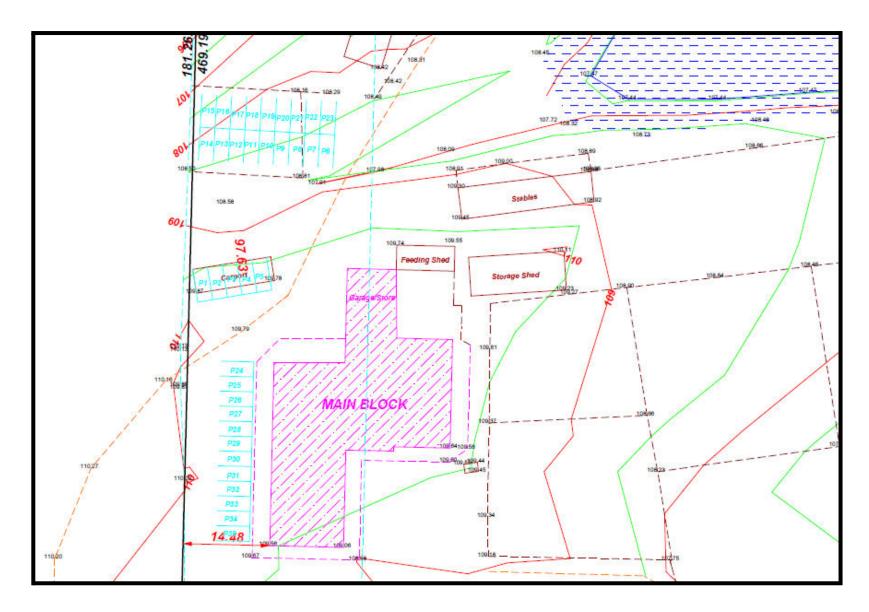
B: DETAIL PLAN ILLUSTRATING PROPOSED PARKING BAYS
